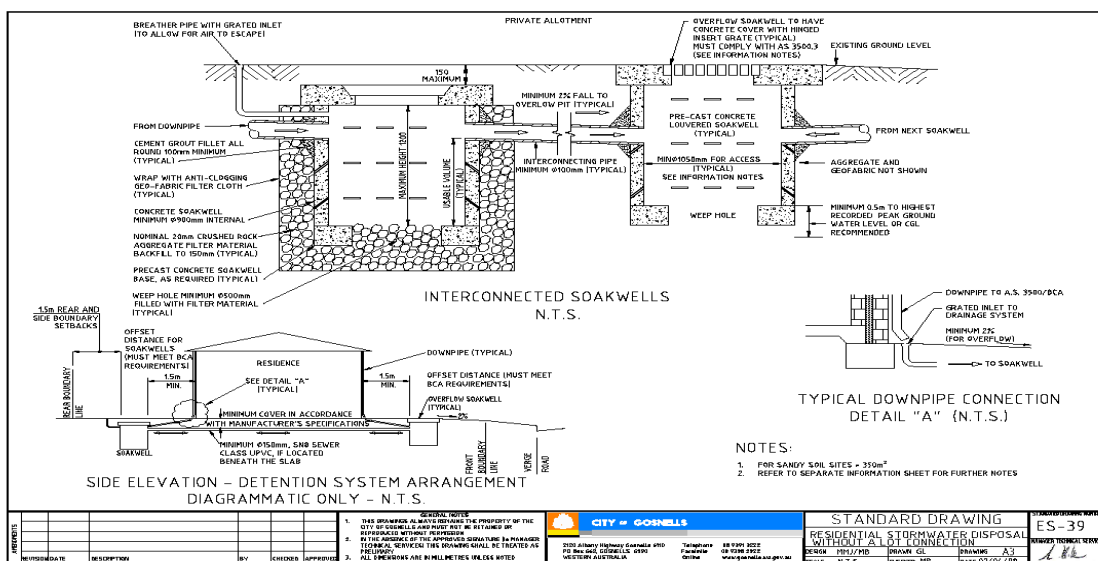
Details of inter-connected soakwells and house/soakwells arrangement: high soil permeability sites
